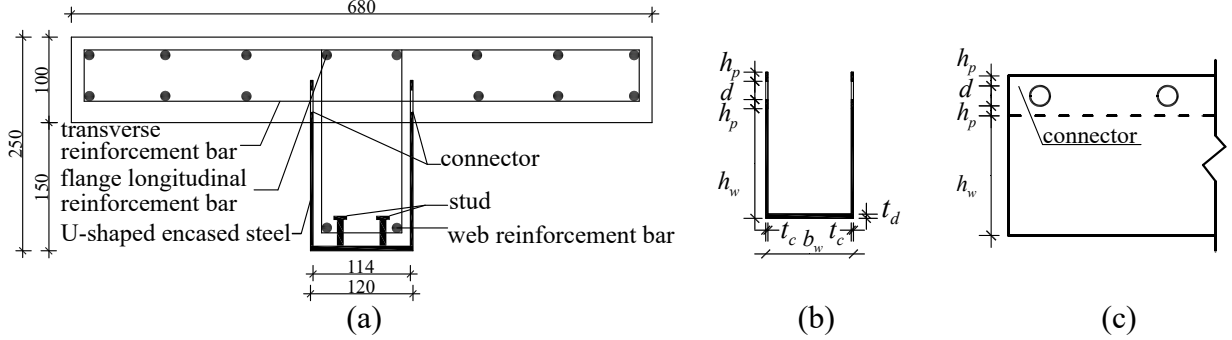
Details of the ZHL1-1 cross-section (dimensions in mm): (a) typical cross-section; (b) U-shaped steel (front view); and (c) U-shaped steel (side view).
